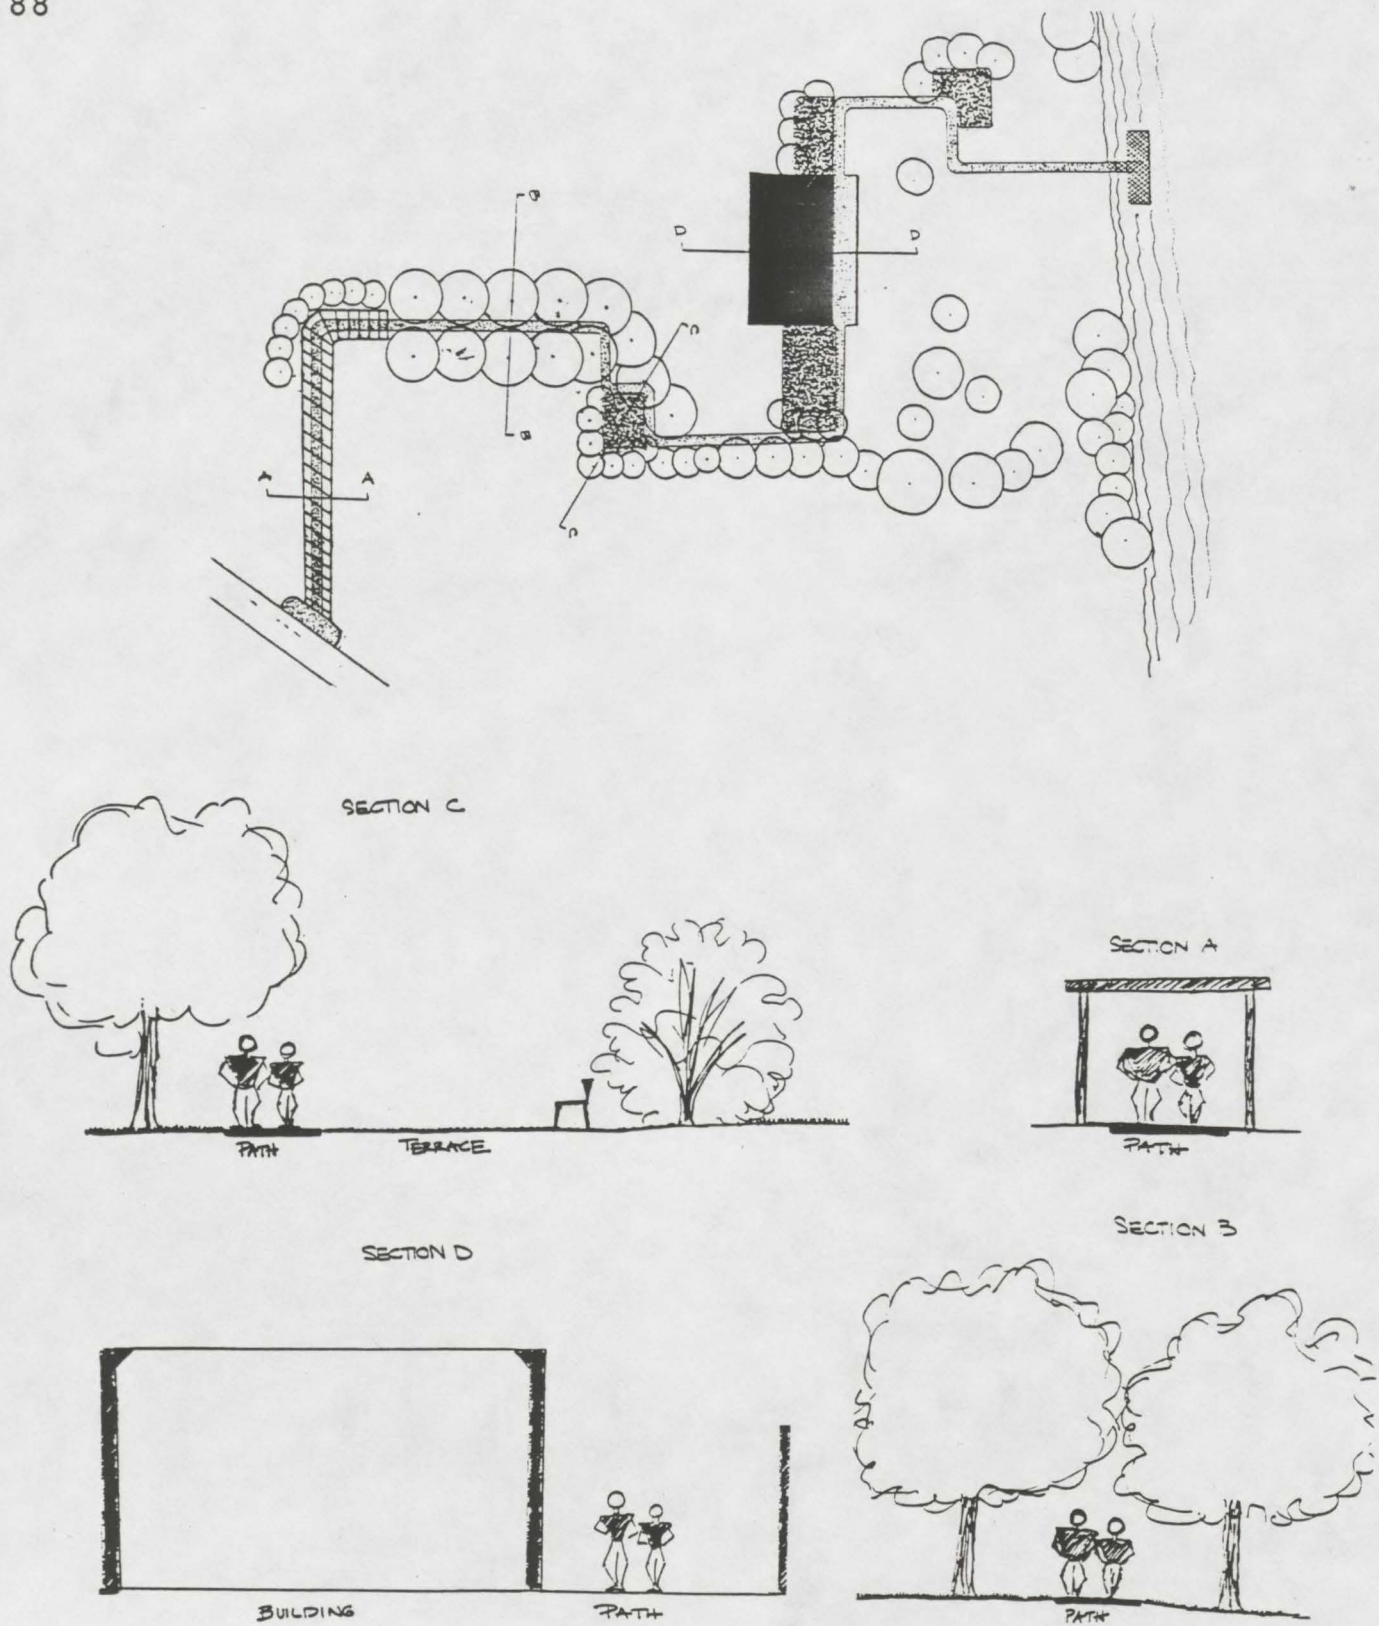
Plan & Cross-sections of Pavilion & Promenade.
